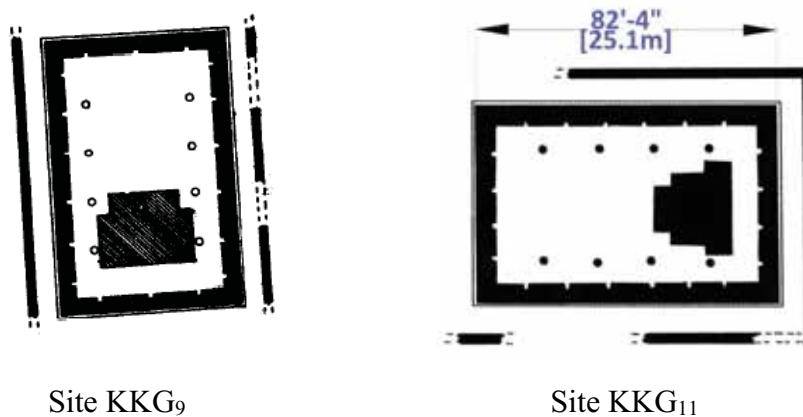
Plans in Beikthano, likely to be the first temples in Myanmar
